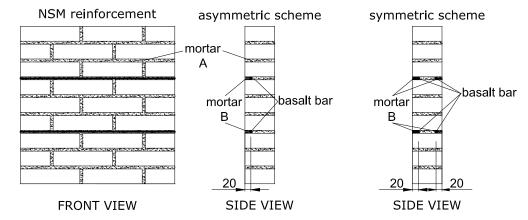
Reinforced masonry wallettes with NSM basalt bars: asymmetric reinforcement scheme (RR-A specimens) and symmetric reinforcement scheme (RR-S specimens). Sizes in mm.
